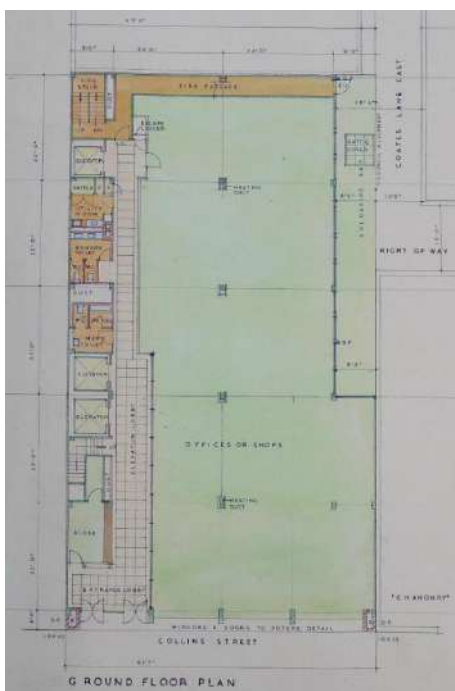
Ground floor plan. Drawing by J A La Gerche, dated June 1957 (BAP).
